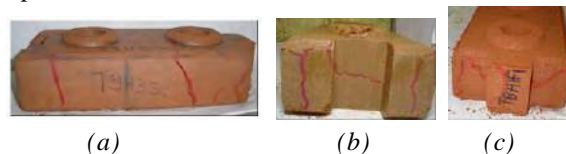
Brick failure, a) longitudinal face, b) in the female fitting, c) into the male
